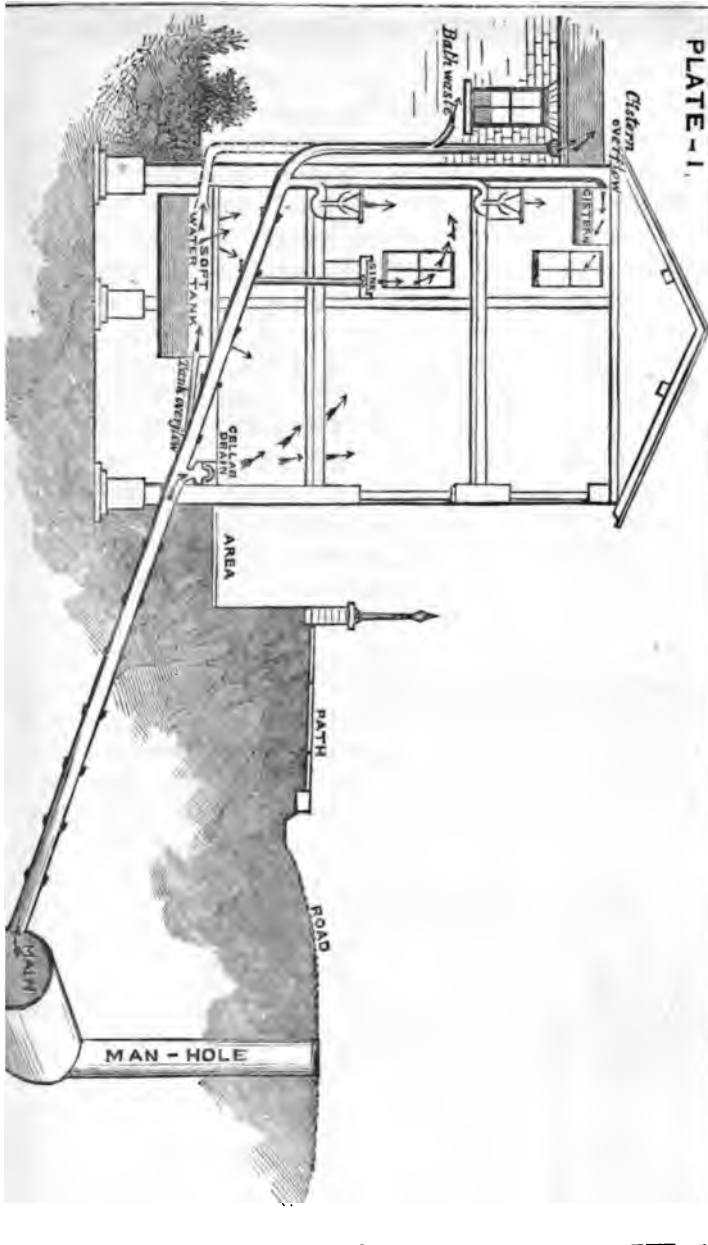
PLATE I.—DIAGRAM OF A TYPICAL TOWN HOUSE, 1878.
